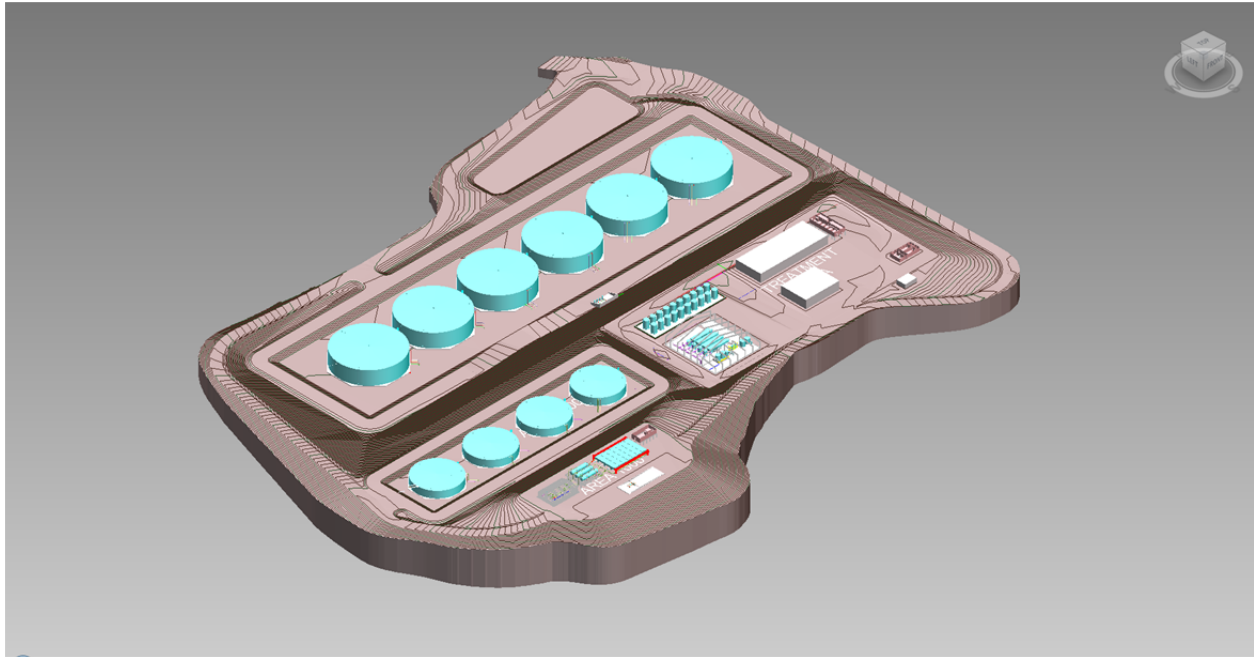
3D Model Containing Civil, Plant/Process and Structural Elements
